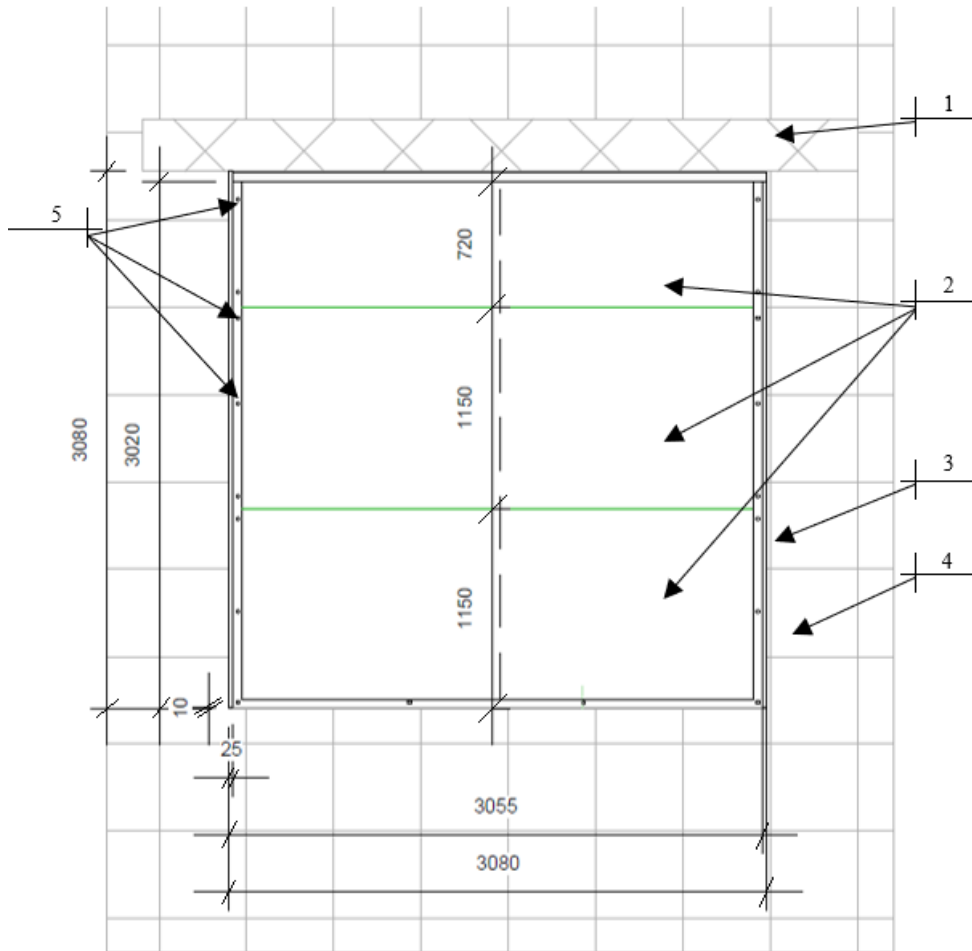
Front view of the assembly of the first sandwich panel wall – Test 1'. The numbered elements correspond to the following components: (1) reinforced concrete lintel with a cross-section of  $240 \times 240$  mm, (2) sandwich panel made of mineral wool – samples described in Section 4.3, (3) free edge filled with insulation material, (4) concrete blocks with a thickness of 24 cm, and (5) self-drilling screws with a diameter of 5.5 mm and a length of 190 mm.
